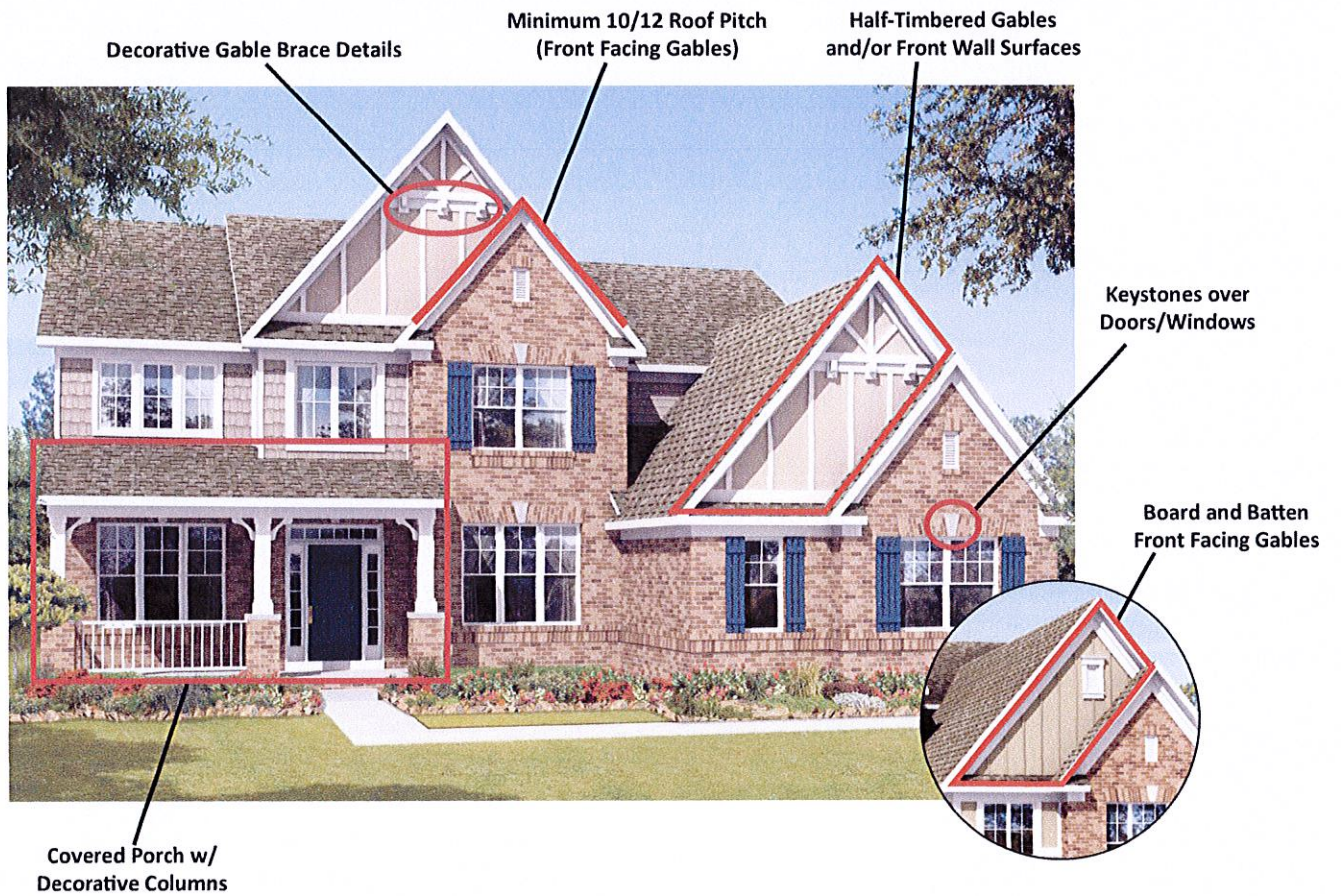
EXHIBIT D - ARCHITECTURAL STYLES GALLERY
